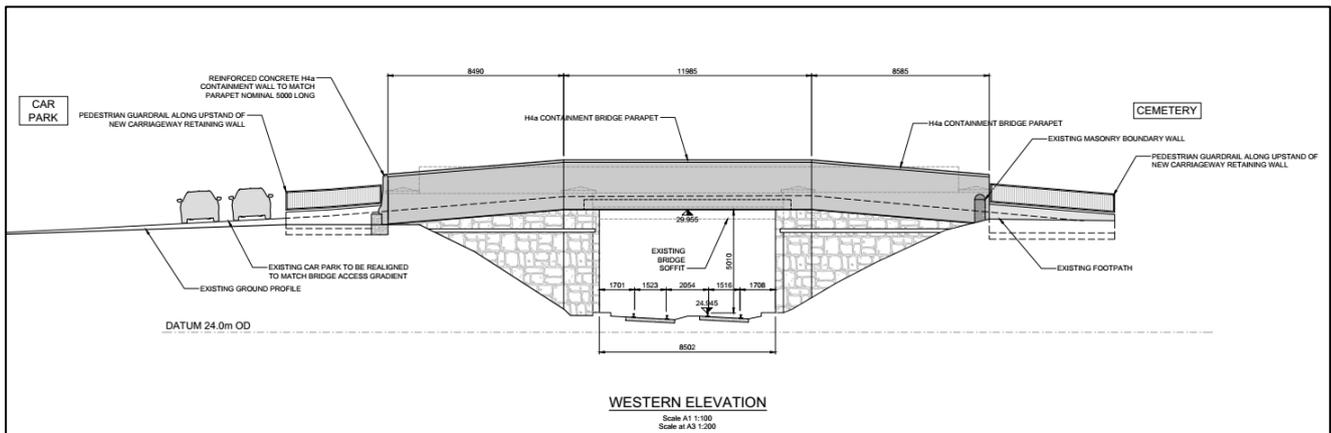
Glasnevin Cemetery Bridge (OBO10) Longitudinal Section – Facing East
